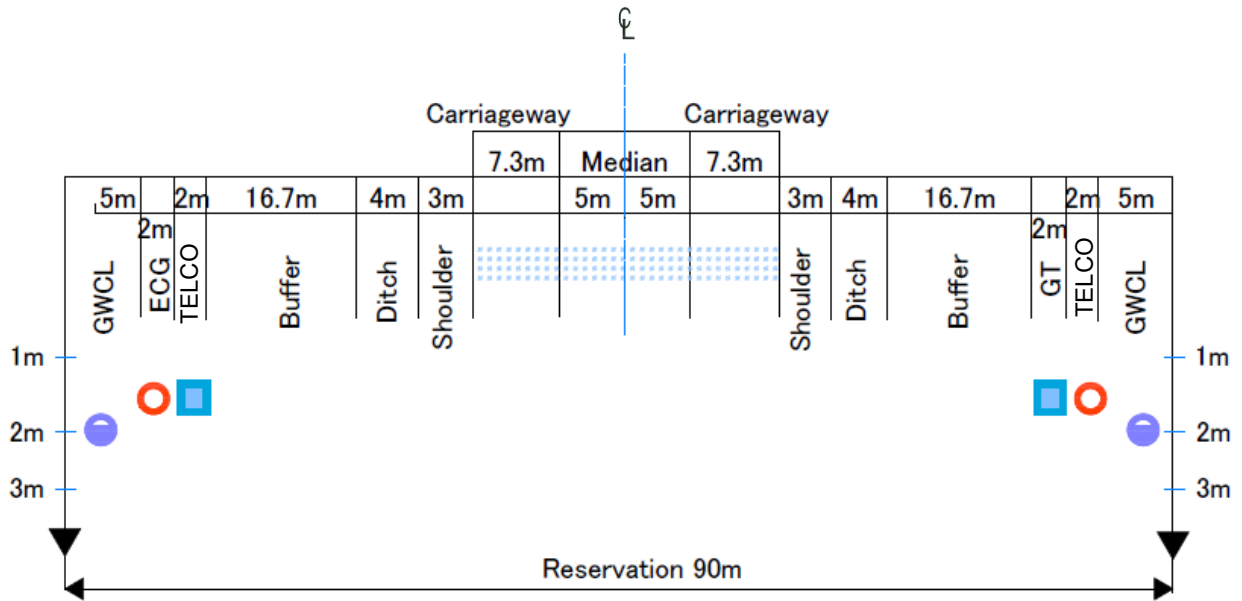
Road reservation for design class A1, A2, B1 and B2 (trunk road)
